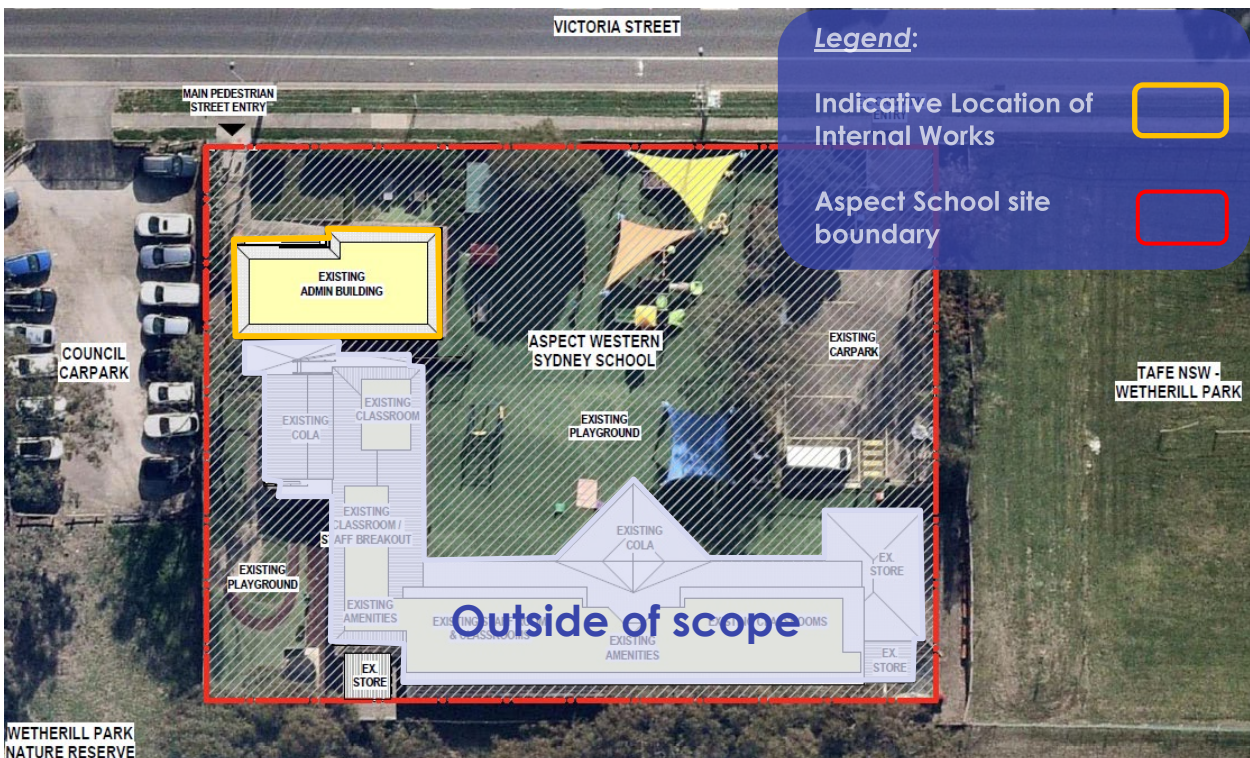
Extract of Site plan with proposed works marked in orange (source: DesignInc)
